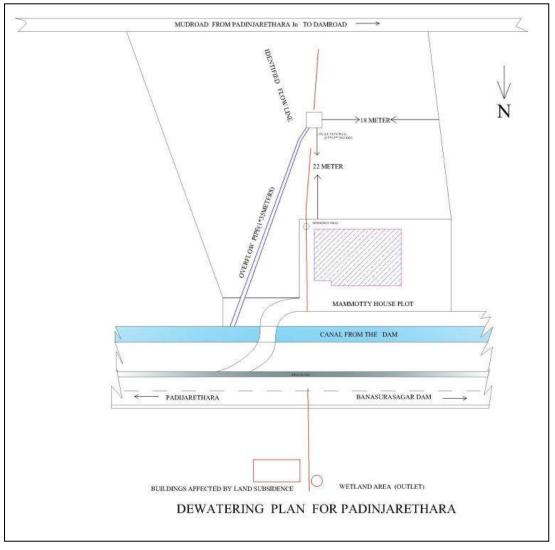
Suggested dewatering plan is to mitigate the piping in Banasurasagar dam
